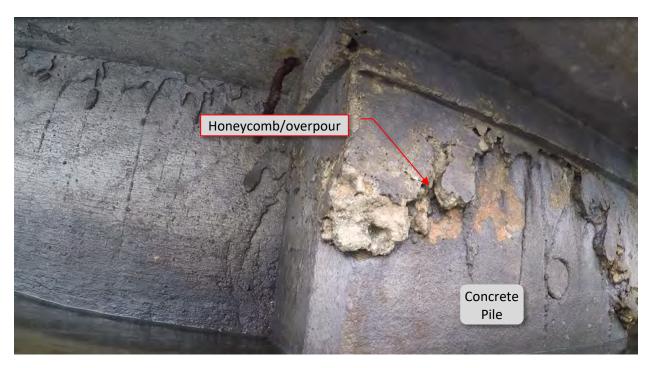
P7. STA 2+83. Honeycomb area and concrete overpour at west flange at pile.
